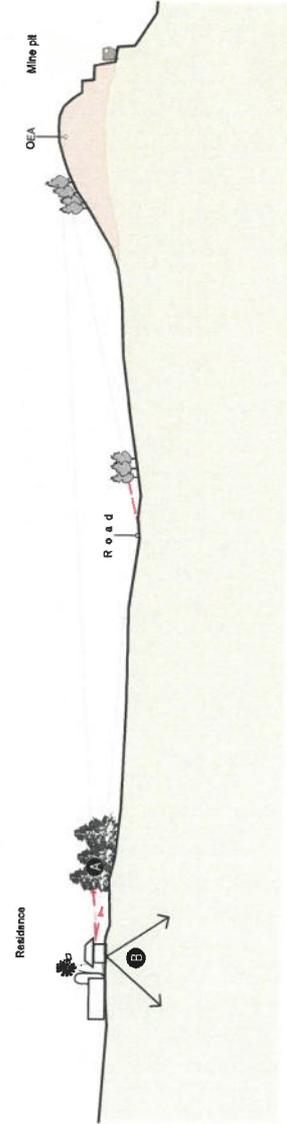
| Typical landscape treatments T3 and T4 screen planting- elevation
